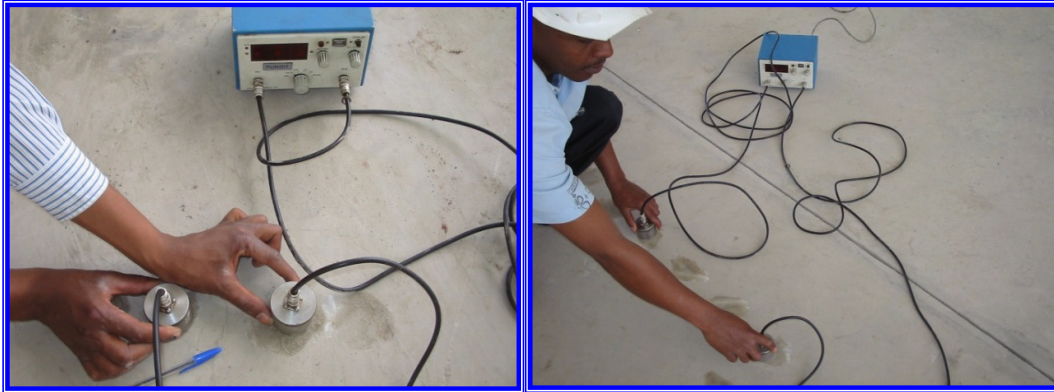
Ultrasonic Pulse Testing Machine used to measure cracks depth
